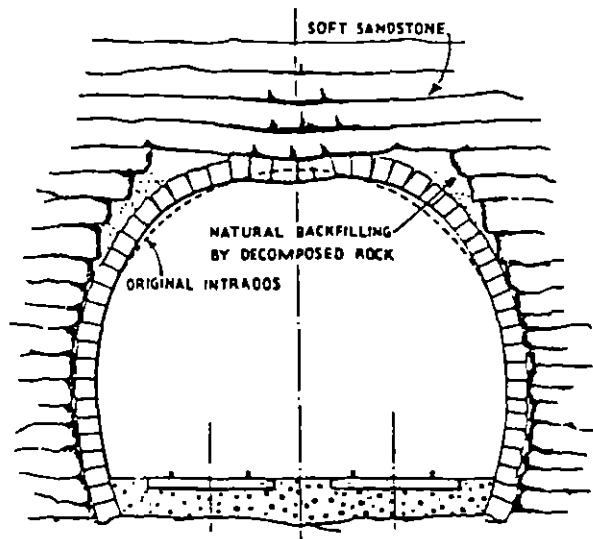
Deformation of a malconstructed tunnel arch by loosening pressure
